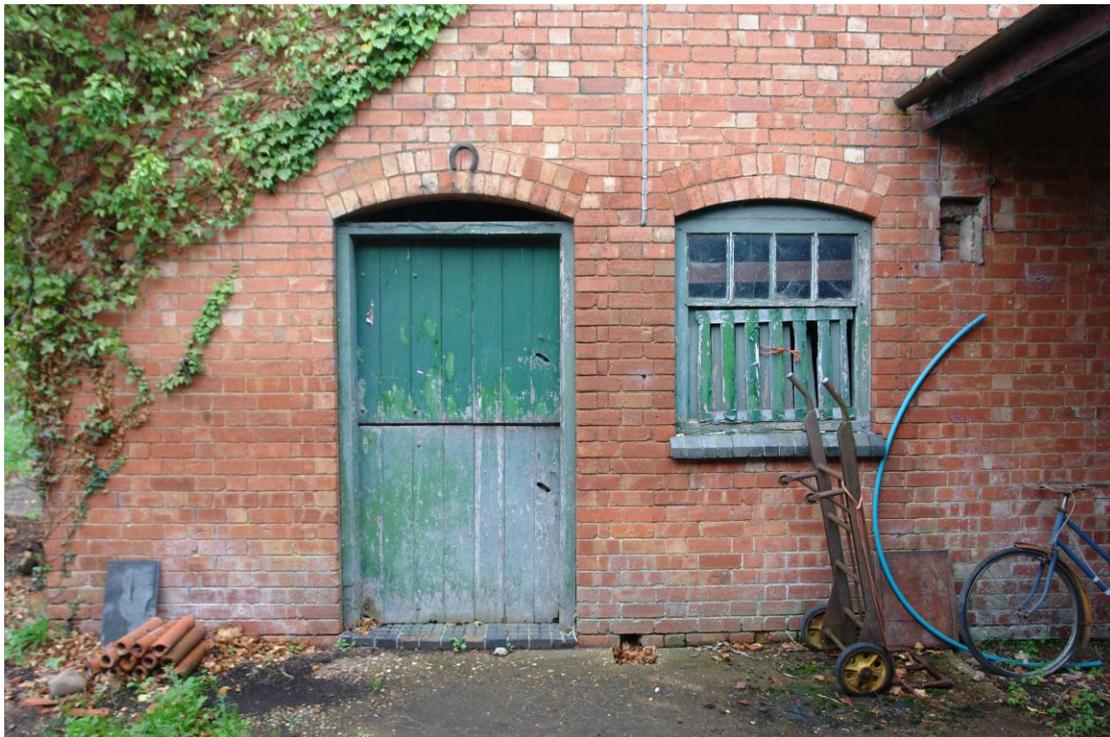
View looking W showing E elevation of Building 1 (Coach House) with later segmental arched doorway and window with blue brick sills
